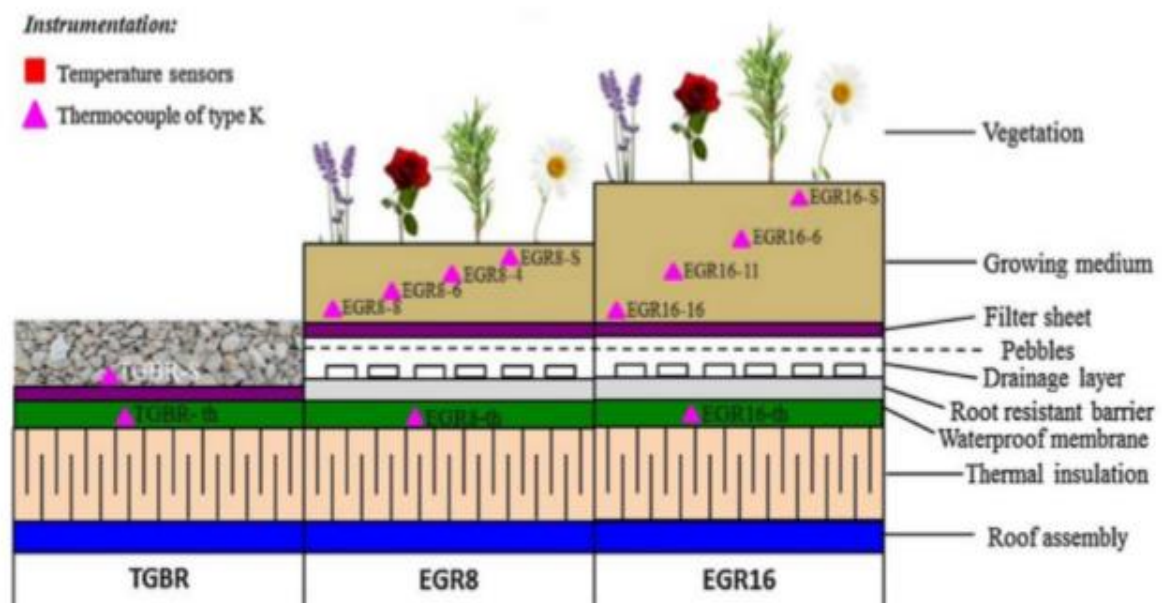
Comparison between traditional and green roof. (a) Traditional roof; (b) Extensive green roof (substrate thickness 8 cm); (c) Extensive green roof (substrate thickness 16 cm) (El Bachawati et al.)
